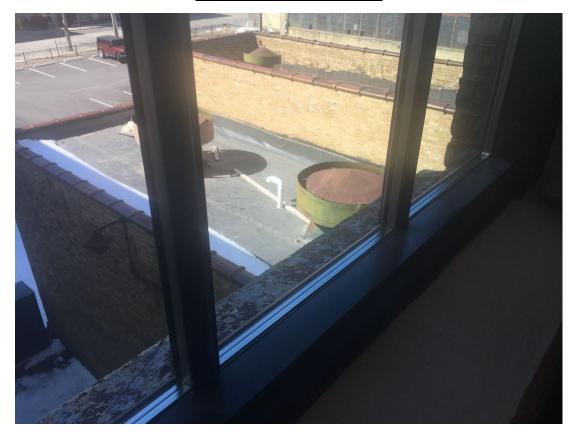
Fan outlet for North Mechanical Room and Powerhouse
